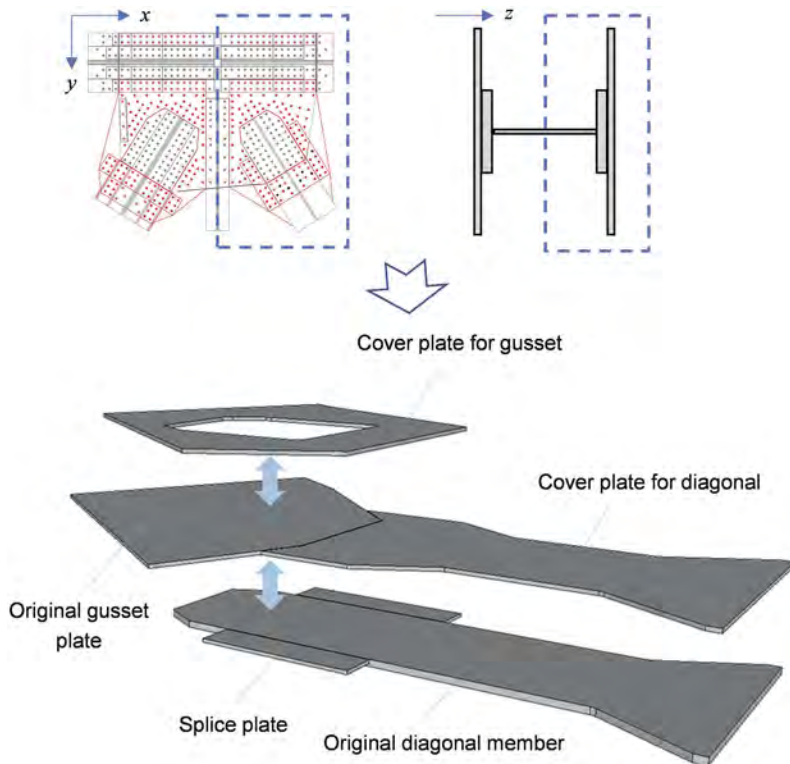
Full-scale joint specimen: one quarter of the prototype joint.
